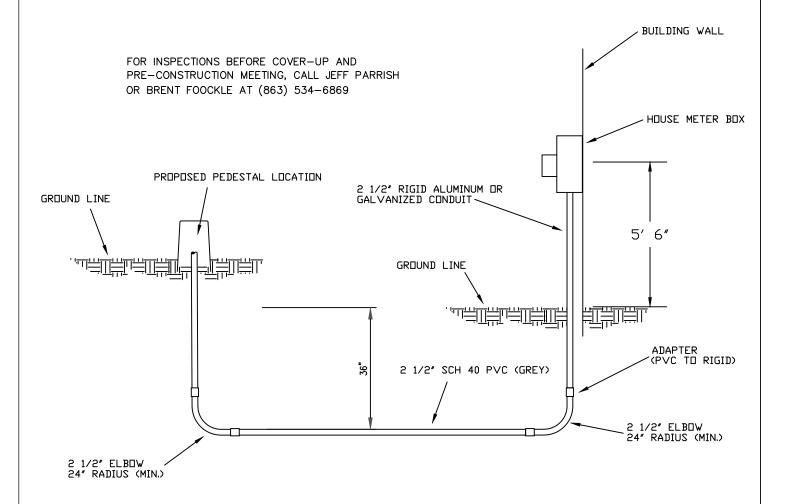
PHASE UNDERGROUND PRIMARY
